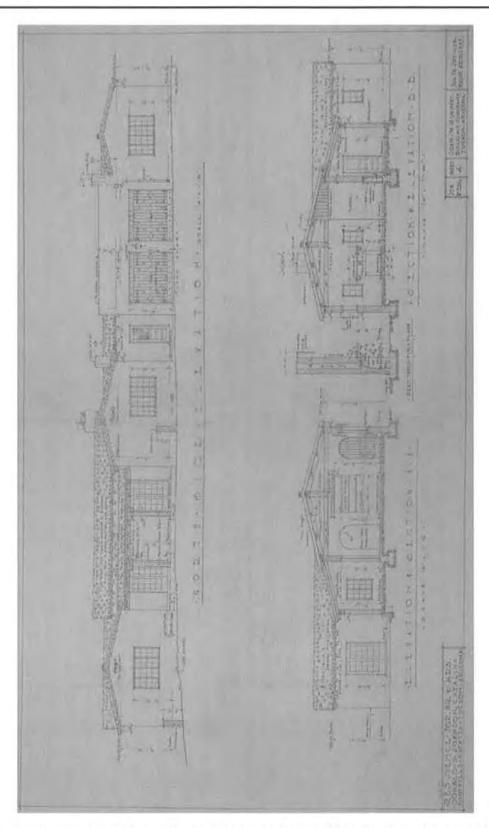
Joesler Elevation Plan (Johnson House) 1931 South, East and West elevations, Arizona Architectural Archive
